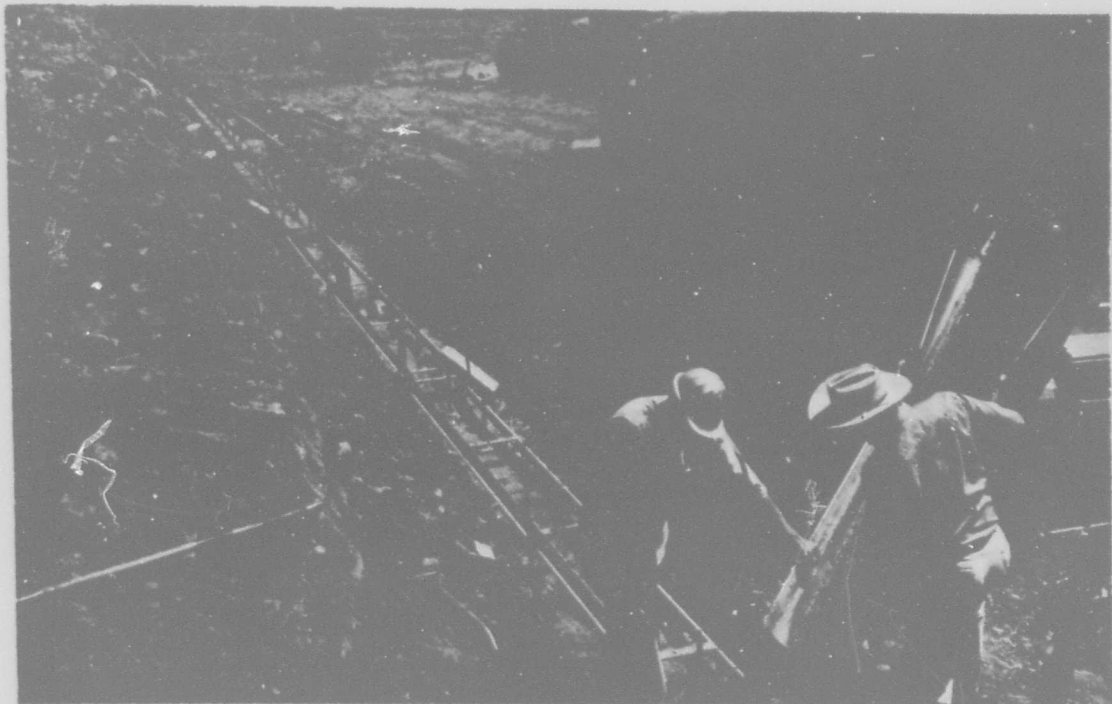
Placing Concrete Curb Around Perimeter of Test Bed to Provide Level Surface for Concrete Wall Forms.
